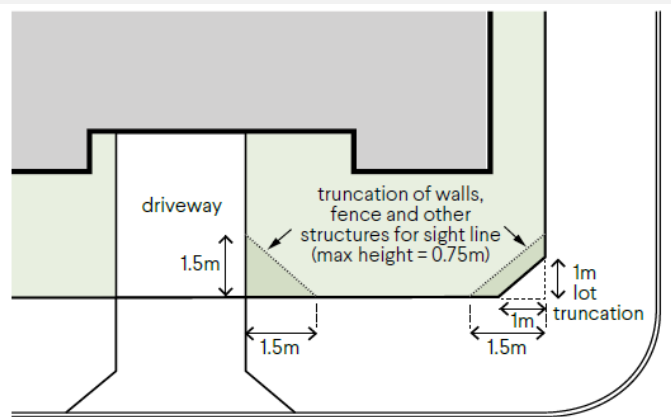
Truncation at street corner to provide sightlines (refer A3.8.7).
